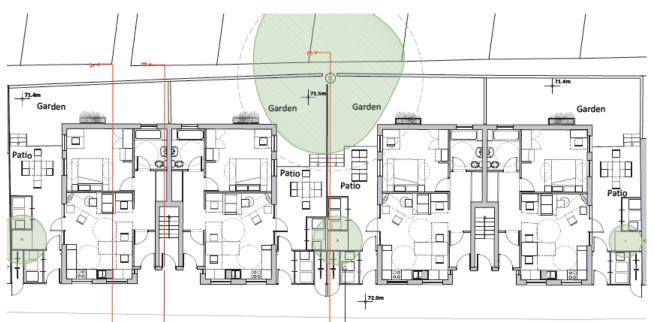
Refused site plan for planning application 16/00018/FUL.
